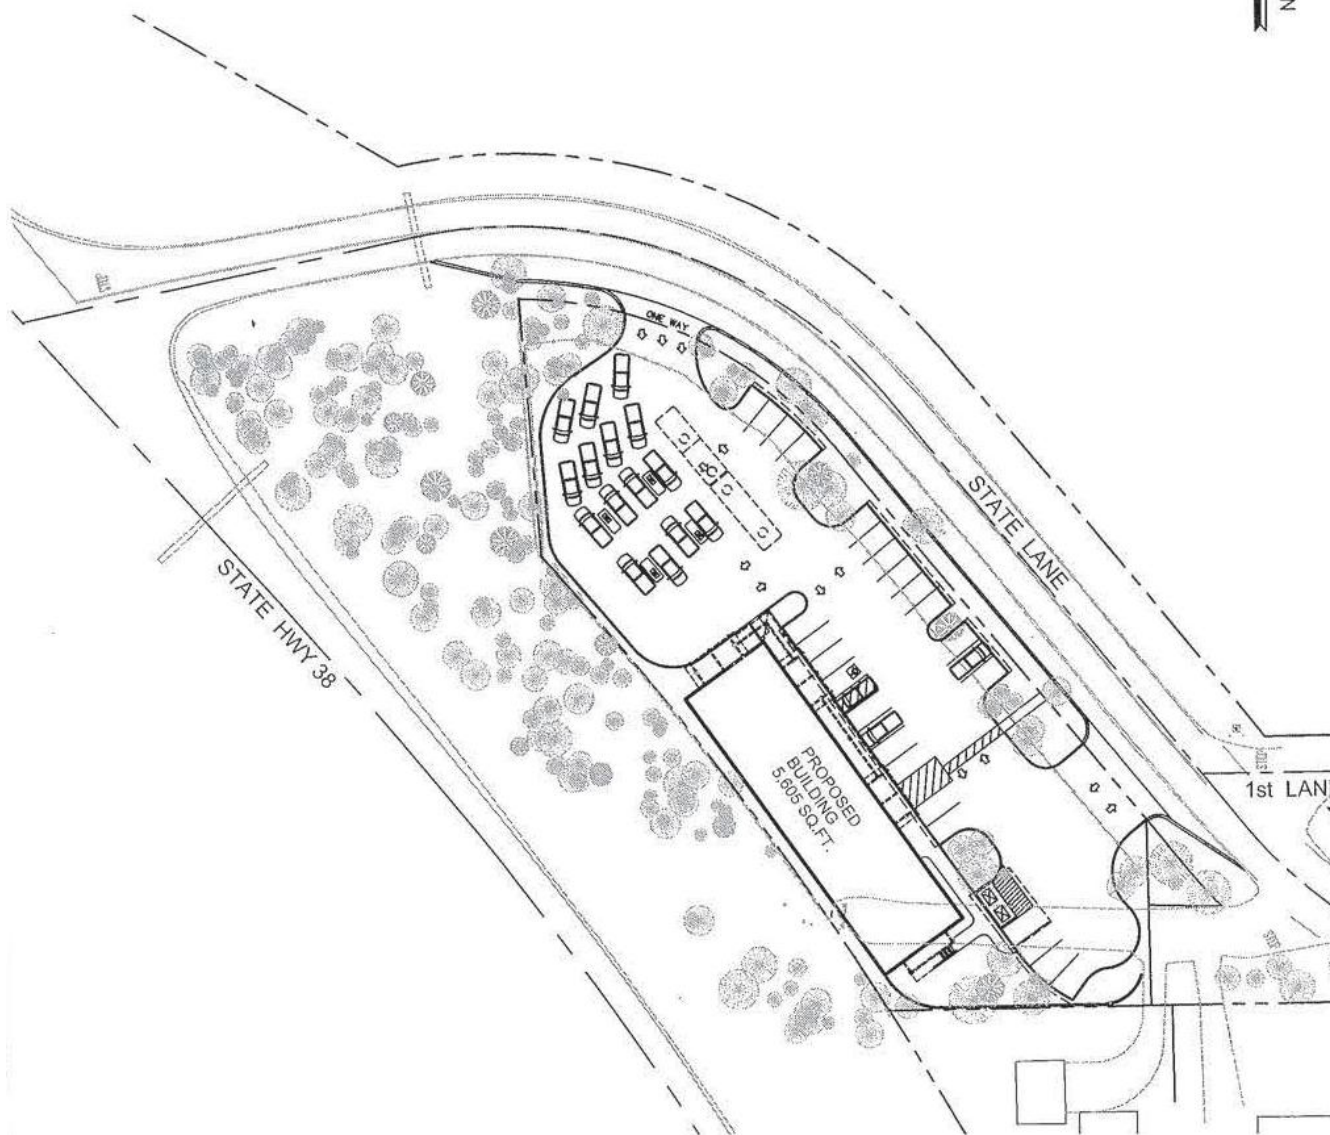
B: PRELIMINARY SITE PLAN
